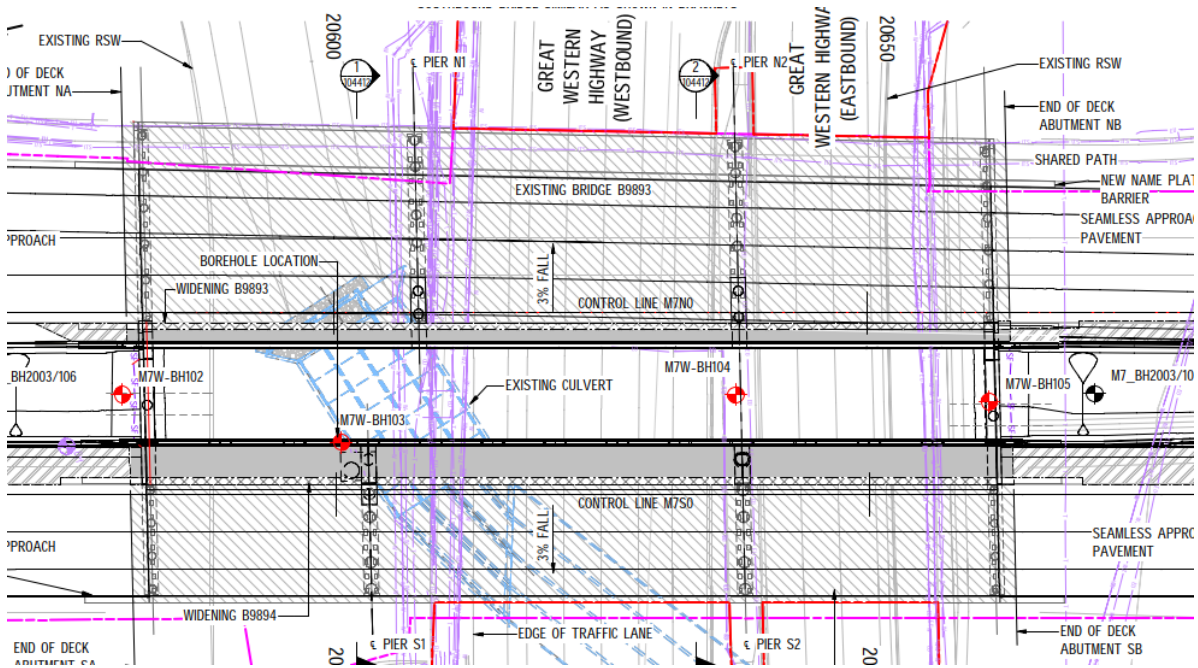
Site Constraint at Infra 27.0/27.1 – Existing Culvert
